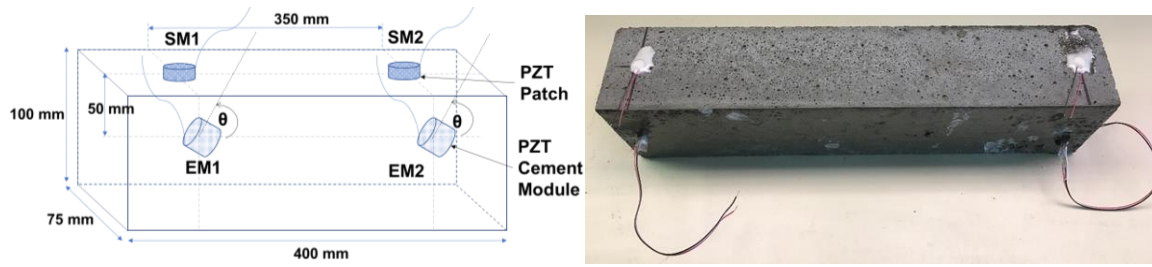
Concrete beam with surface-mounted PZT patches and embedded PZT cement modules
